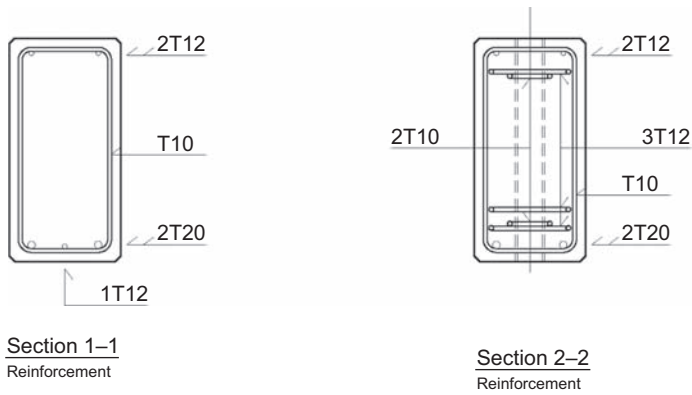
Cross section of the reinforced concrete beam. Note: All dimensions in millimeter.
